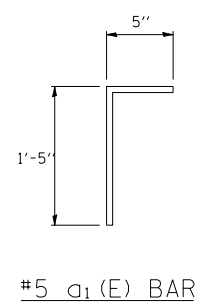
## DETAIL OF EXISTING RAILING FOR INFORMATION ONLY
